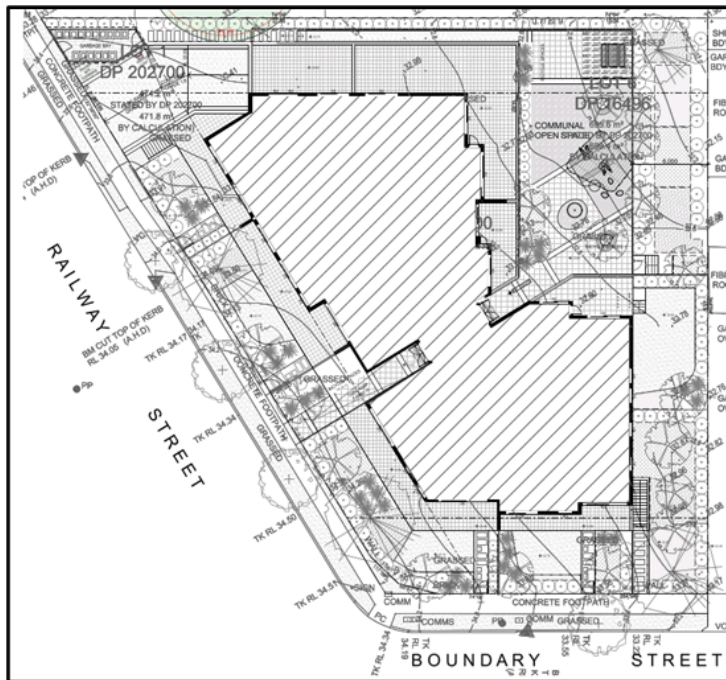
Proposed layout of the site (Source. extracted from the submitted plans)
